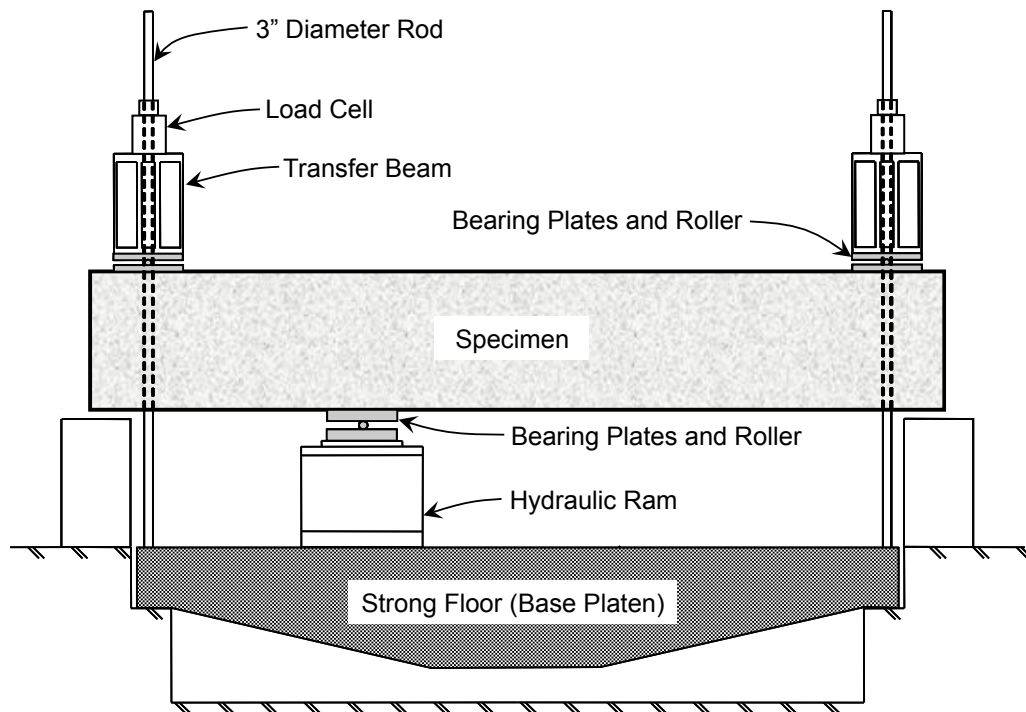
Elevation view of test setup [Huizinga (2007)].
